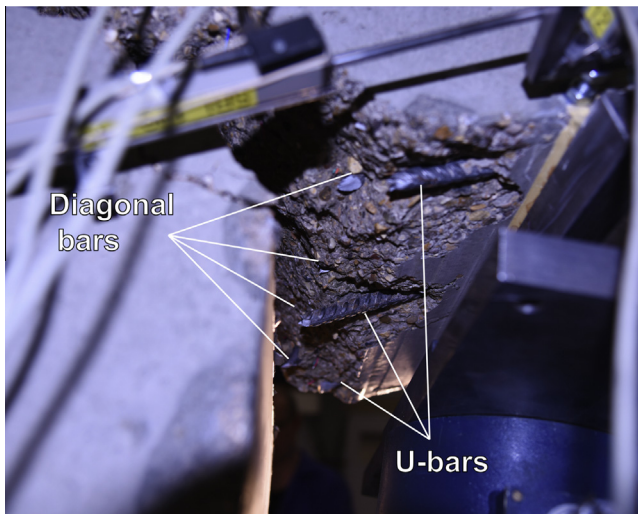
Rupture of diagonal and U-bar reinforcement for the reference specimen NS-REF at failure.
